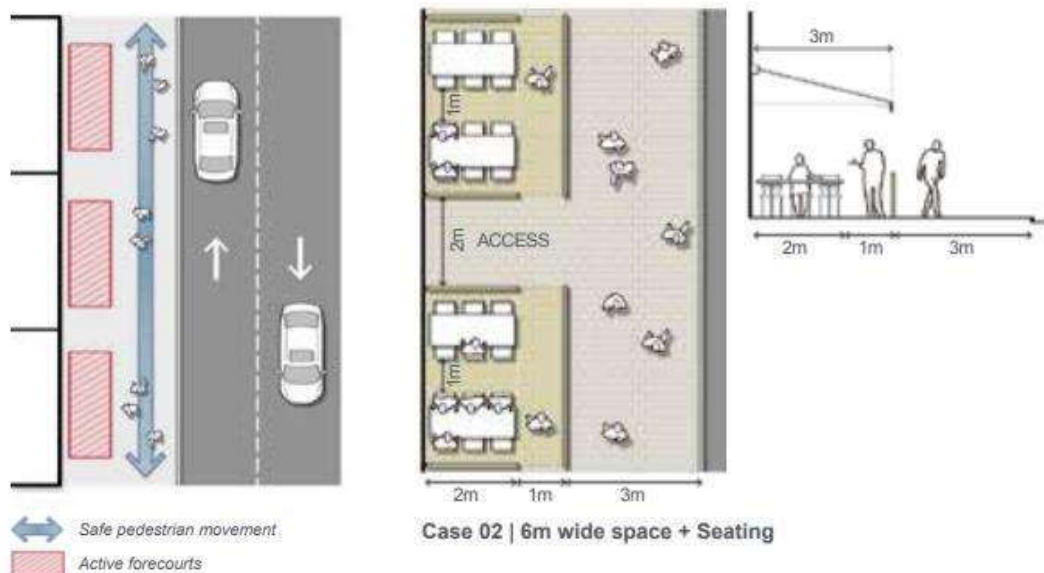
Example of Outdoor Dining and Seating Within the Public Footpath (Placeholder image)
